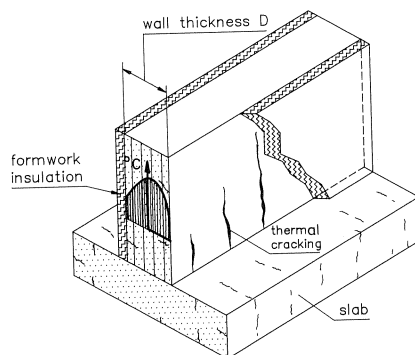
Early-age thermal cracking in a slab-wall construction. Through-cracks and surface cracks [4].
